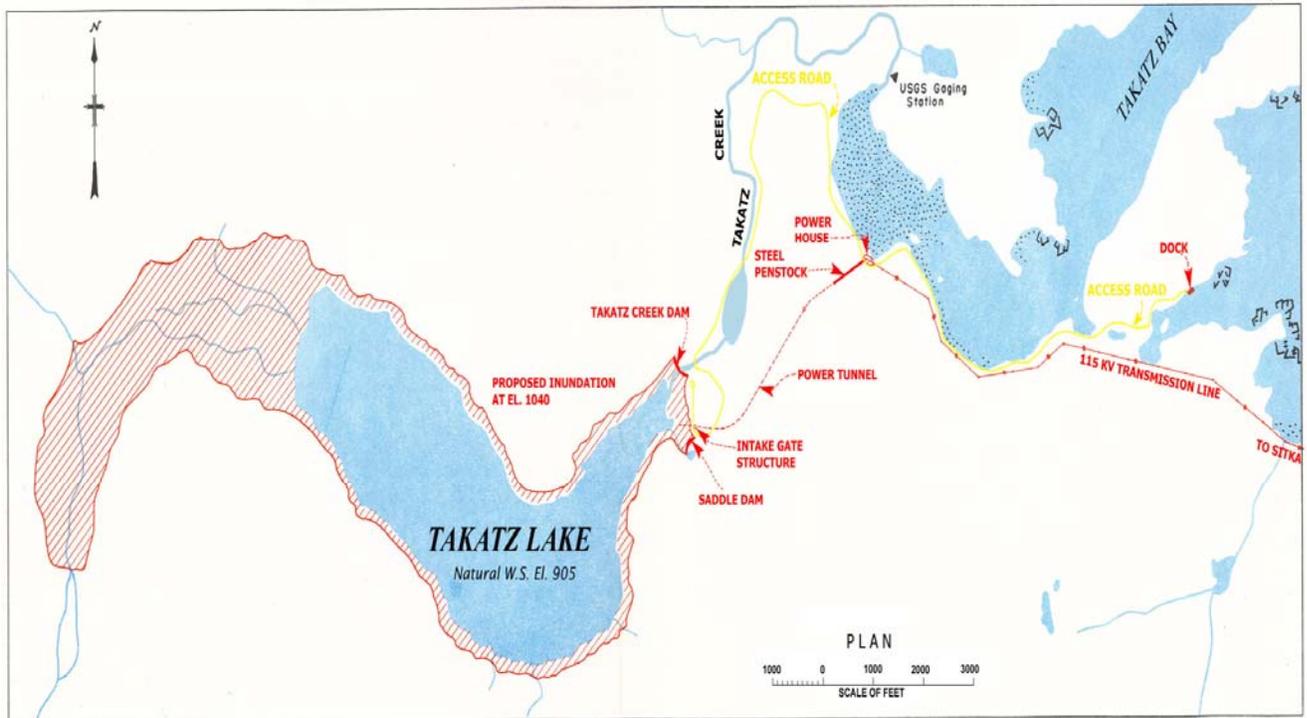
Project facilities for the Takatz Lake Project (Source: City and Borough of Sitka Electric Department, PAD, 2009).
